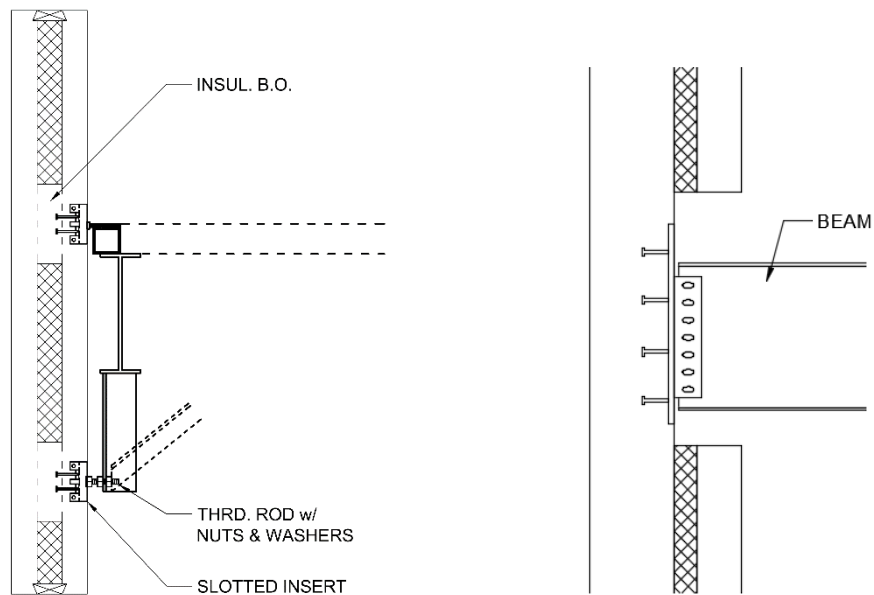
Sample floor termination details that create a thermal breach in the insulation
